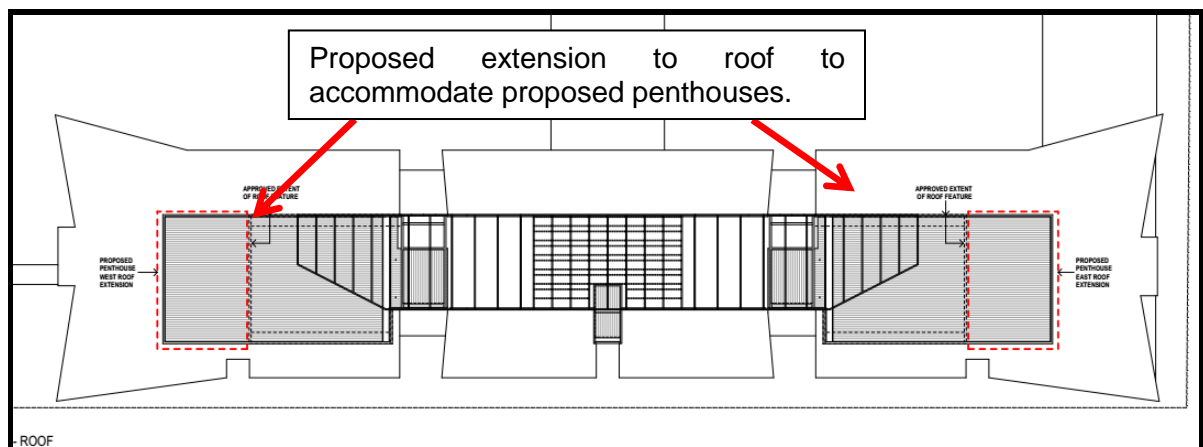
Proposed Roof Plan (Source: Clark Keller, dwp Suters, December, 2016)
